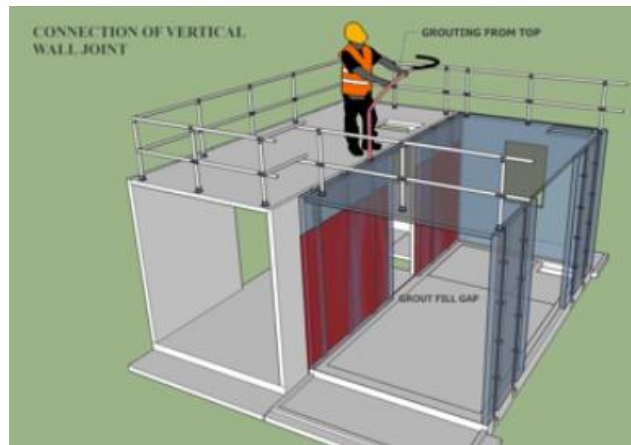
Grouting in between modules (Building and Construction Authority, 2021)
